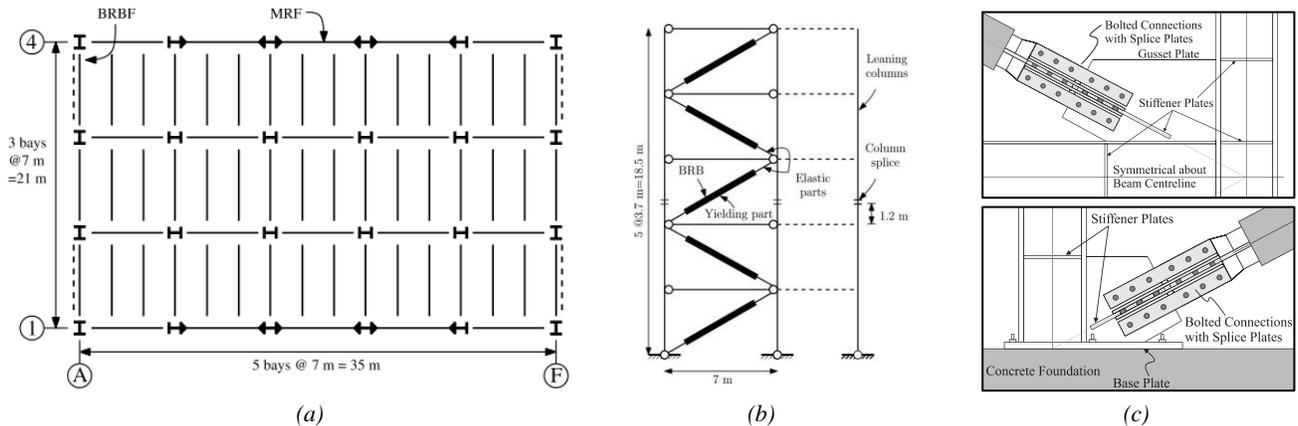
Reference Structure, (a) Plan, (b) BRBF, and (c) Gusset Plate Connection Details
